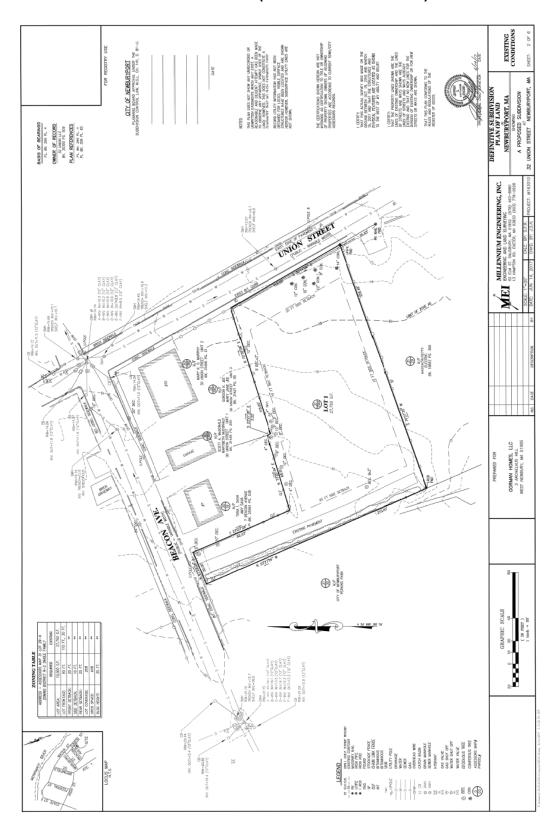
AS-OF-RIGHT SINGLE FAMILY HOUSE PLAN (ANDERSON PLAN)
